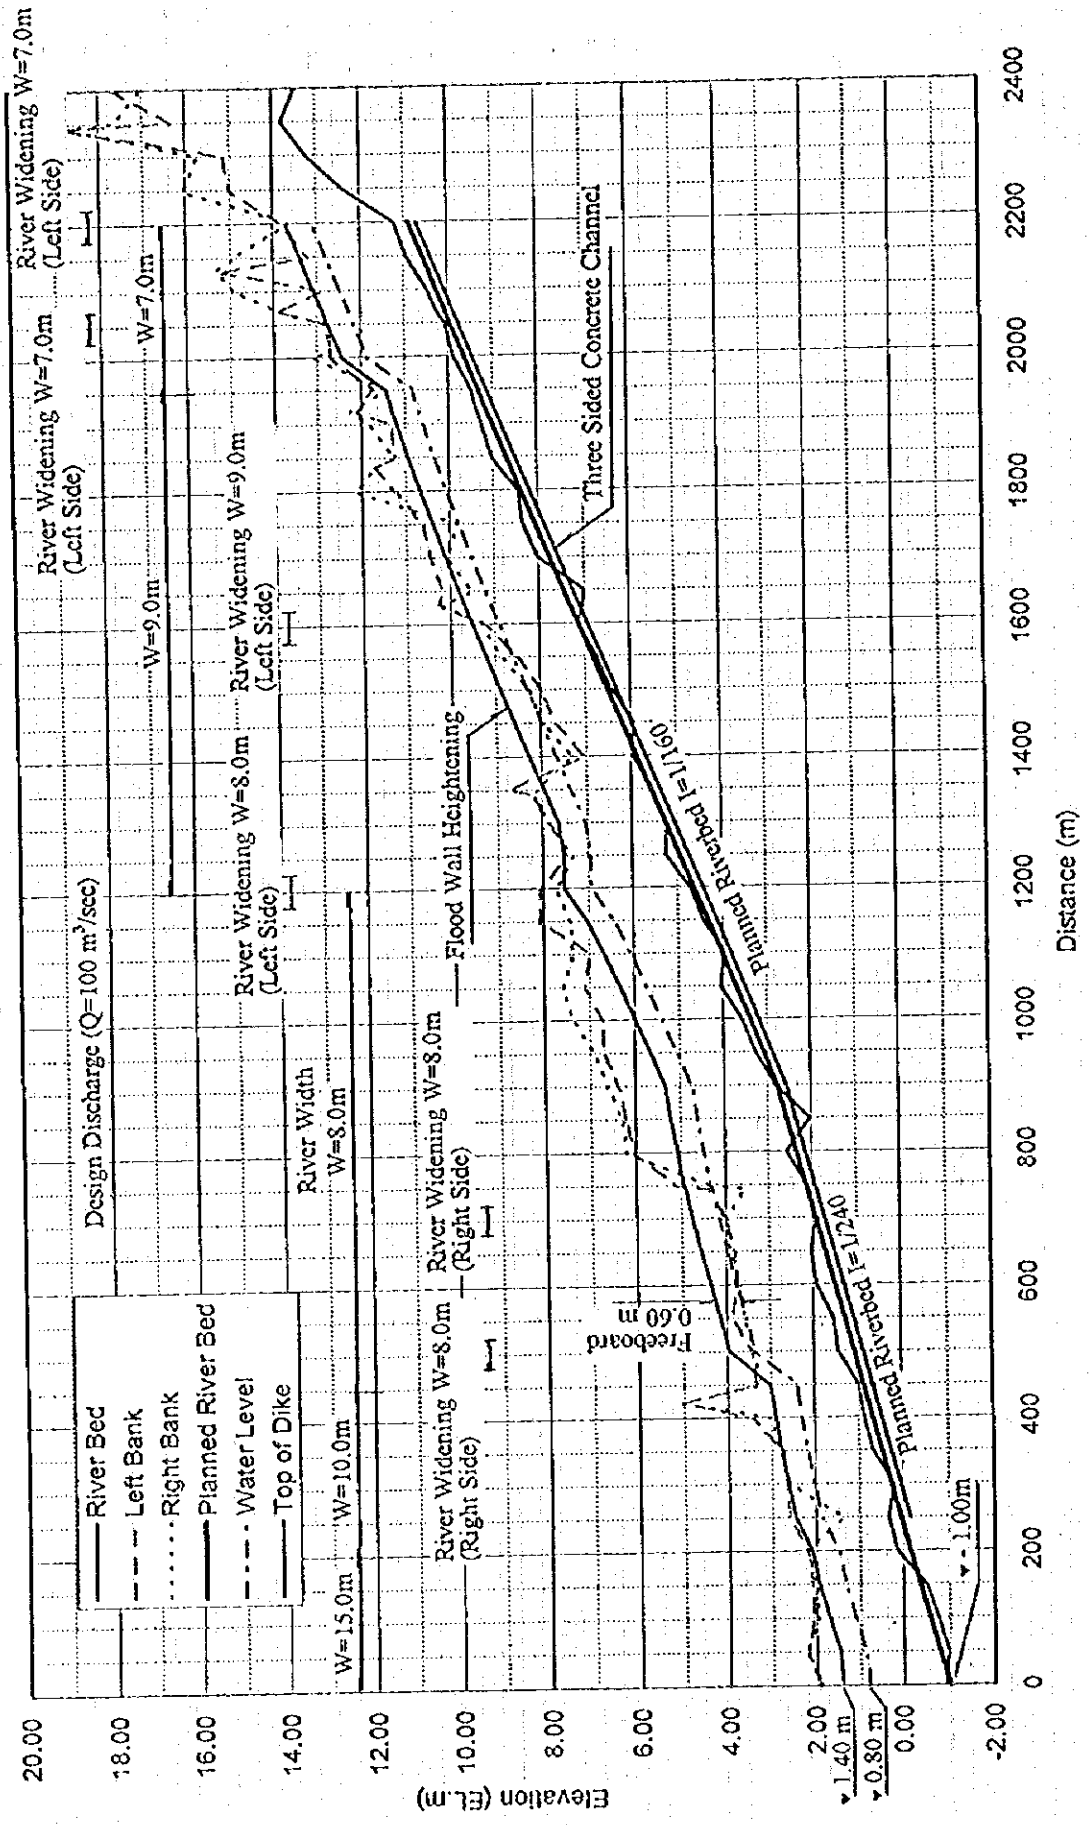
Longitudinal Section of Batu Gajah River Improvement Plan
